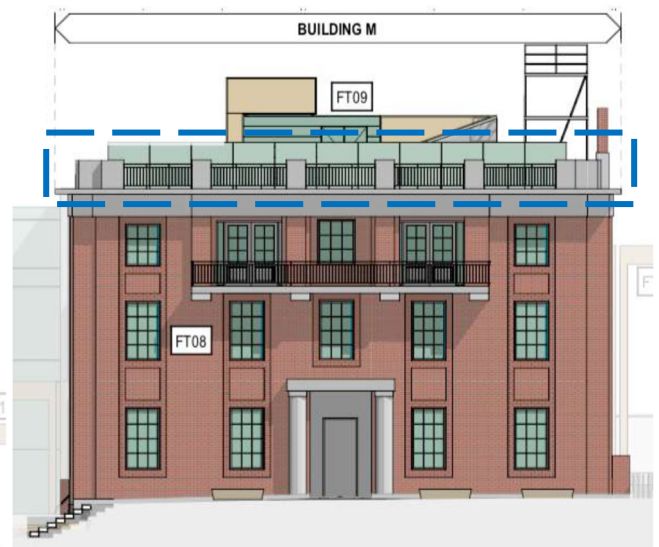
The SSD HIS, with the Safety Protection Structures indicated in dash blue outline (Figure 8.28: Proposed North Elevations – Building M, (Source: FJMT 2020 SSDA Design Report: 65)).
